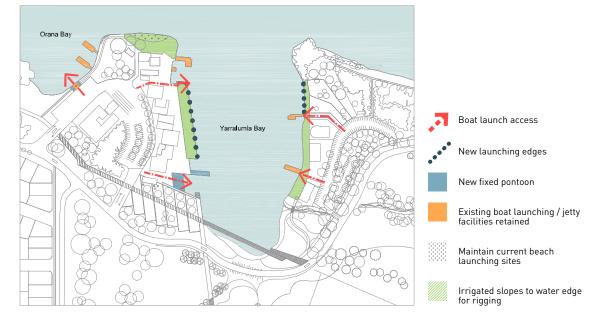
BOAT LAUNCHING FACILITIES AND ACCESS
